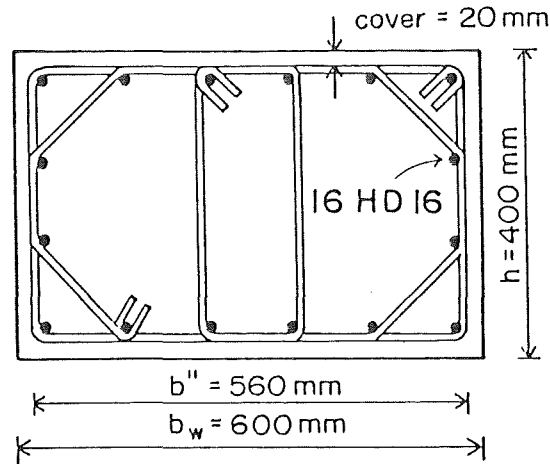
CROSS SECTION OF RECTANGULAR COLUMNS
